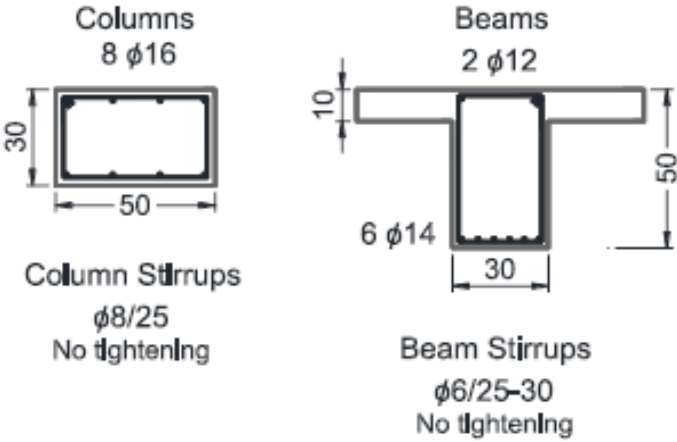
Cross-section specifications of Alaköy school building (Taşkın et. al, 2014).
